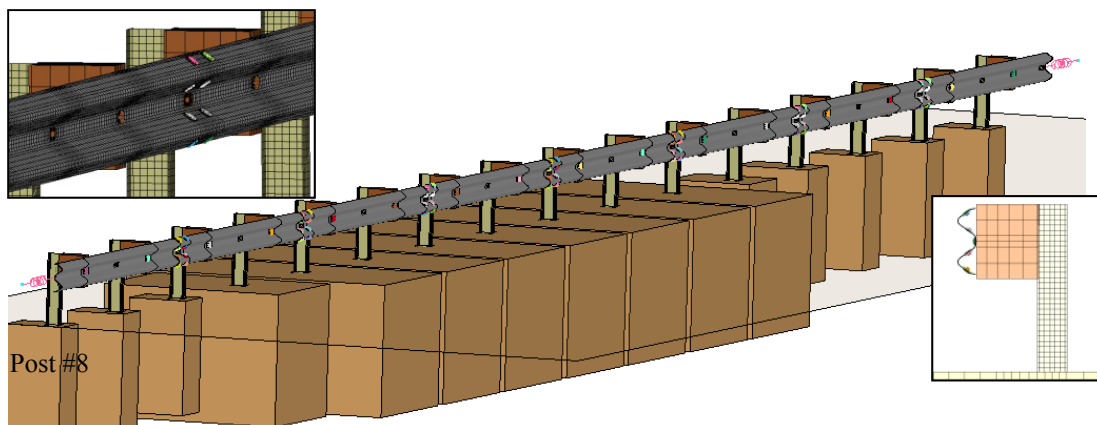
Finite Element Model developed for the Midwest Guardrail System.
